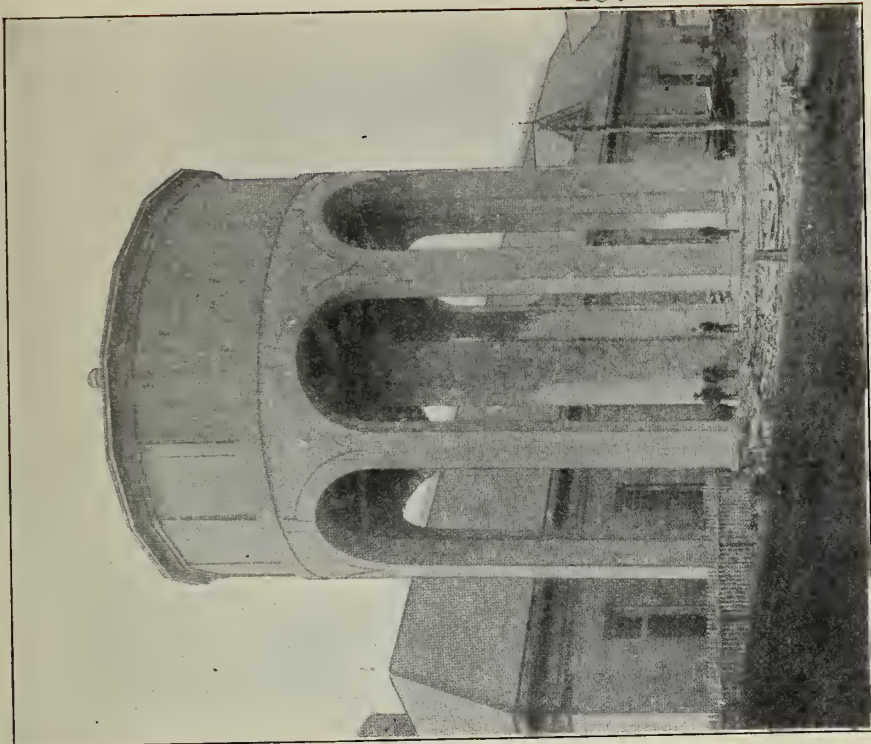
A reinforced concrete elevated wash-water tank built for the Louisville Water Company's filtration plant. Height over all 80 feet, elevation of tank above ground level 46 feet 2 inches.
